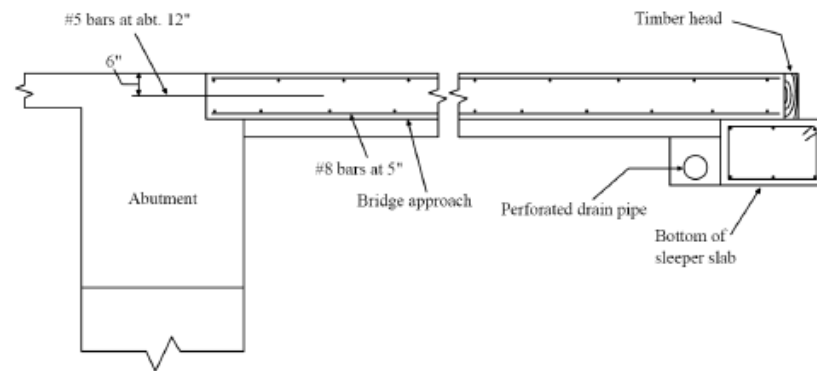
Bridge Approach Connected to Bridge Deck (Missouri DOT, 2003)
